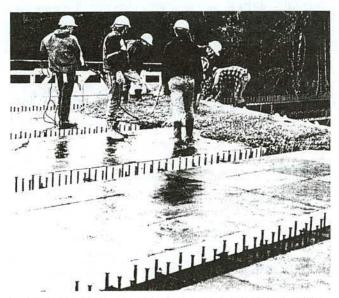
Placing FRC deck, Salmon River Bridge (157).
